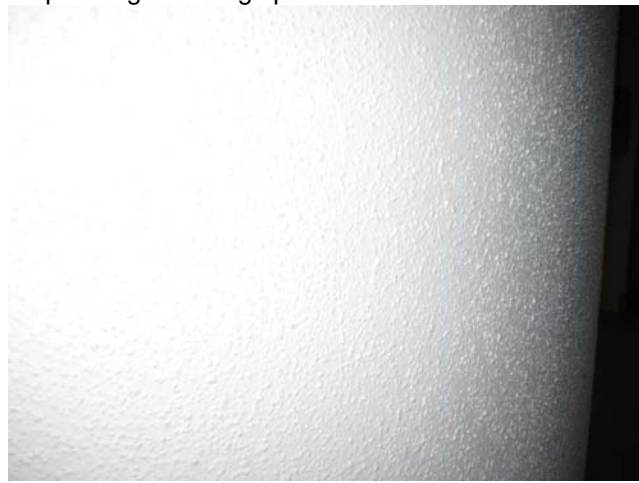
[Rm.5/7] Sprayed fibrous fireproofing in ceiling space (Sample set TH-5).
